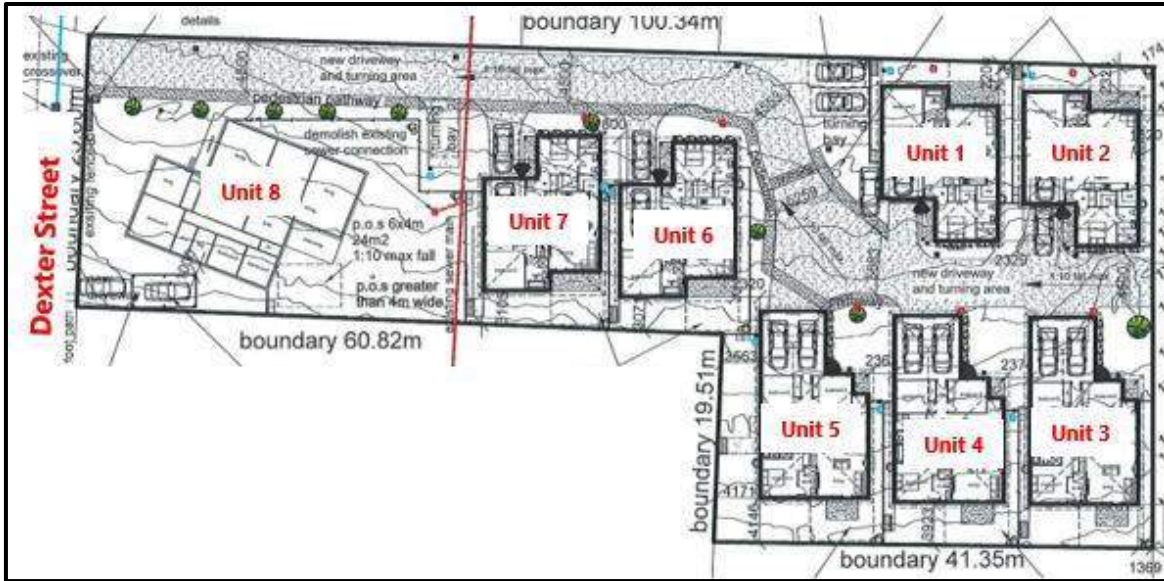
Excerpt of the submitted site plan showing the layout of the proposed dwellings.
